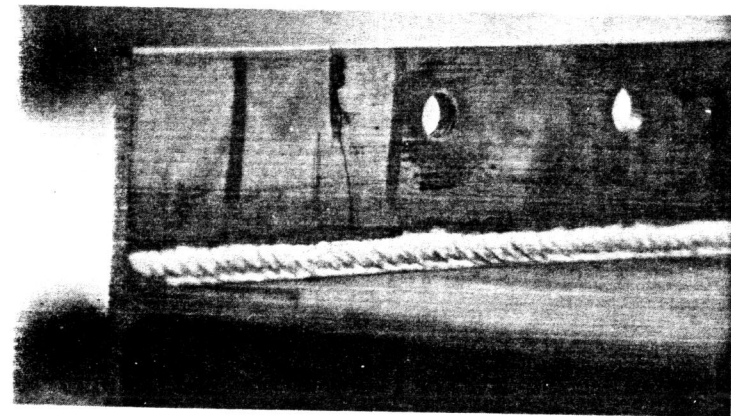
Fretting fatigue crack forming at end of steel plate
